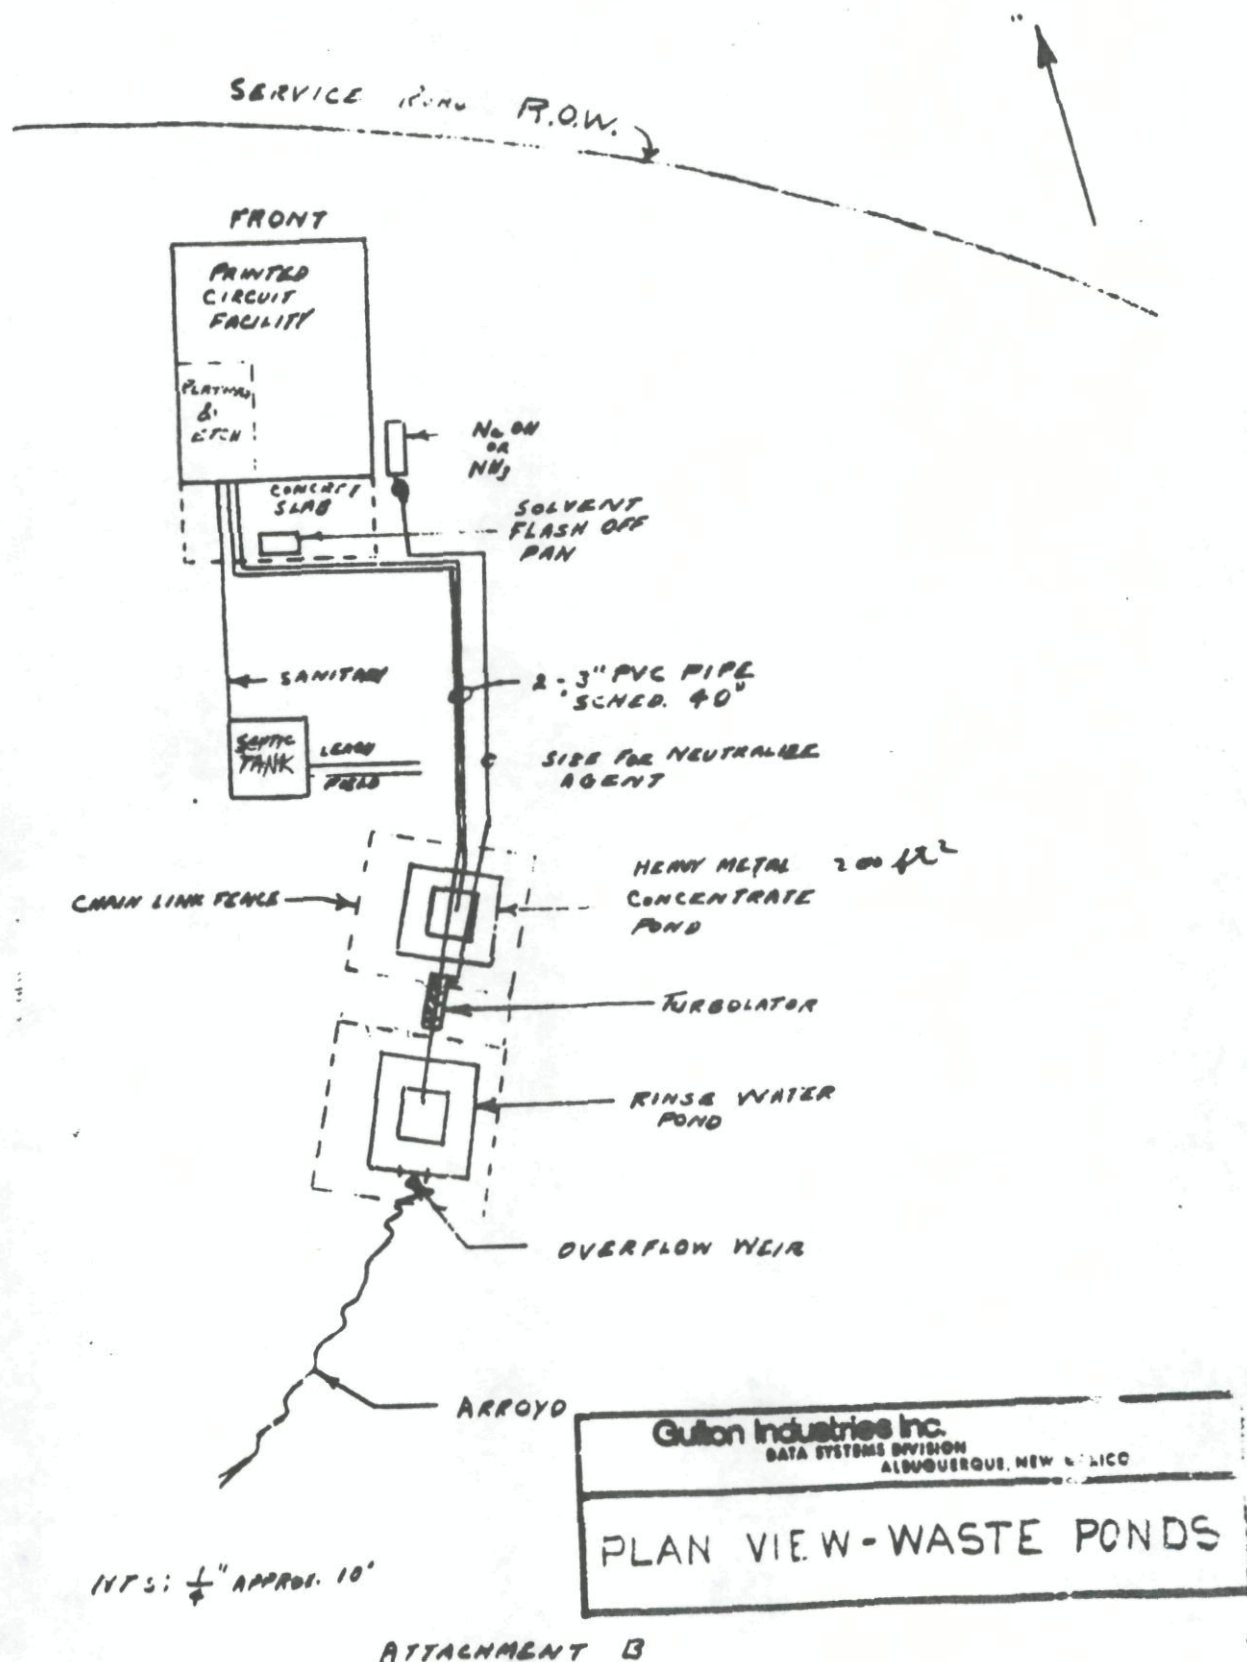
Plan View of the Waste Treatment Facility Submitted to New Mexico Health and Environment Department, 1970.
